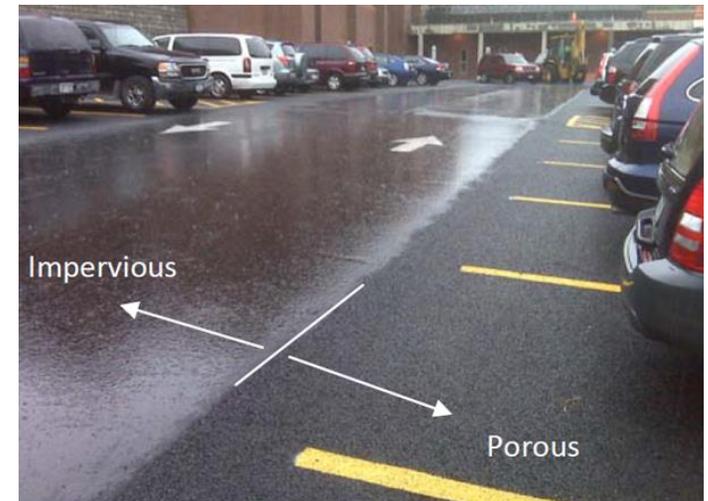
Permeable asphalt on-street parking during rain event, Syracuse (Source: Milwaukee Green Streets Stormwater Plan)
